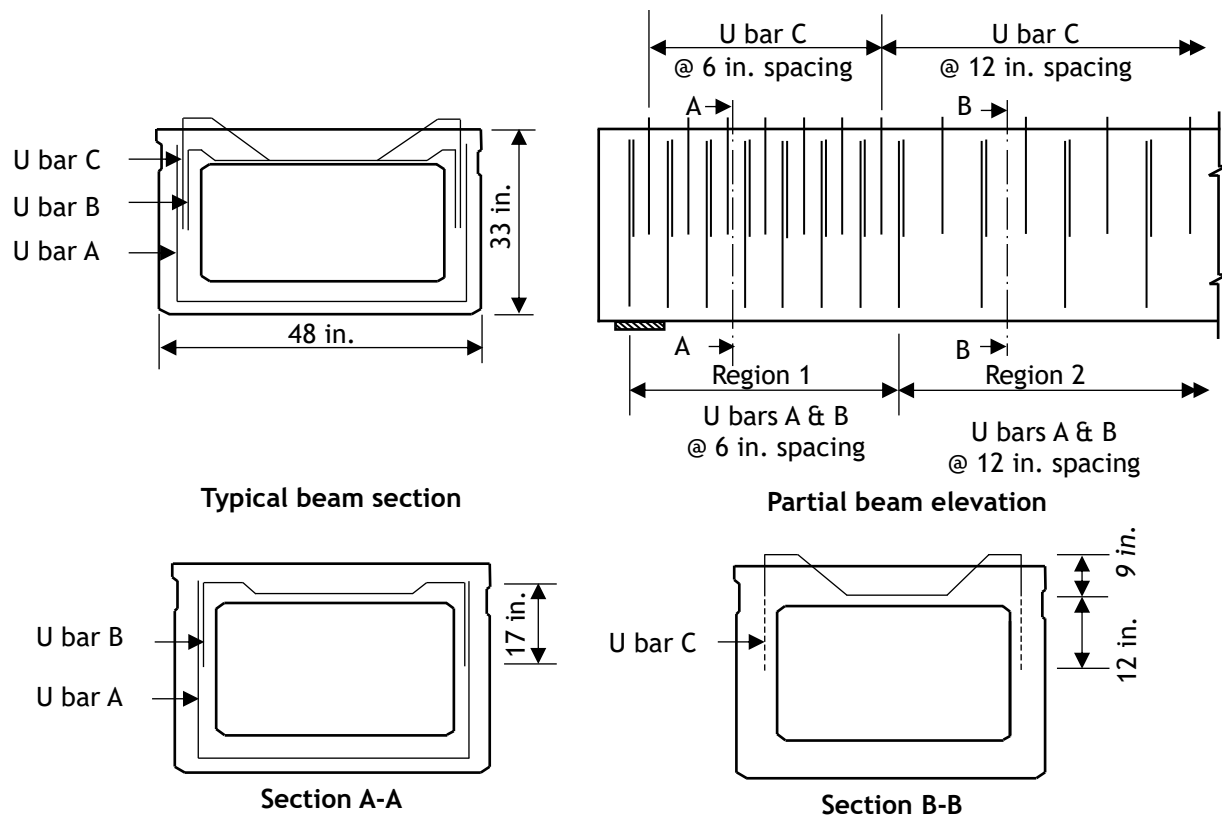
Typical beam section and elevation of CB33-36 beam.
